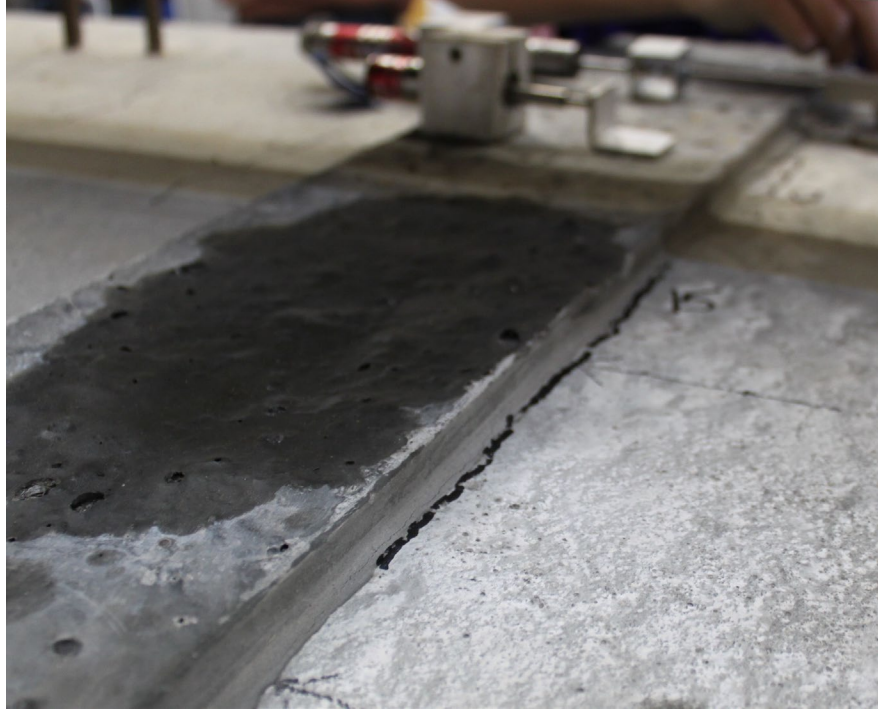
Cracks at the interface between the UHPC joint and concrete deck panel.
